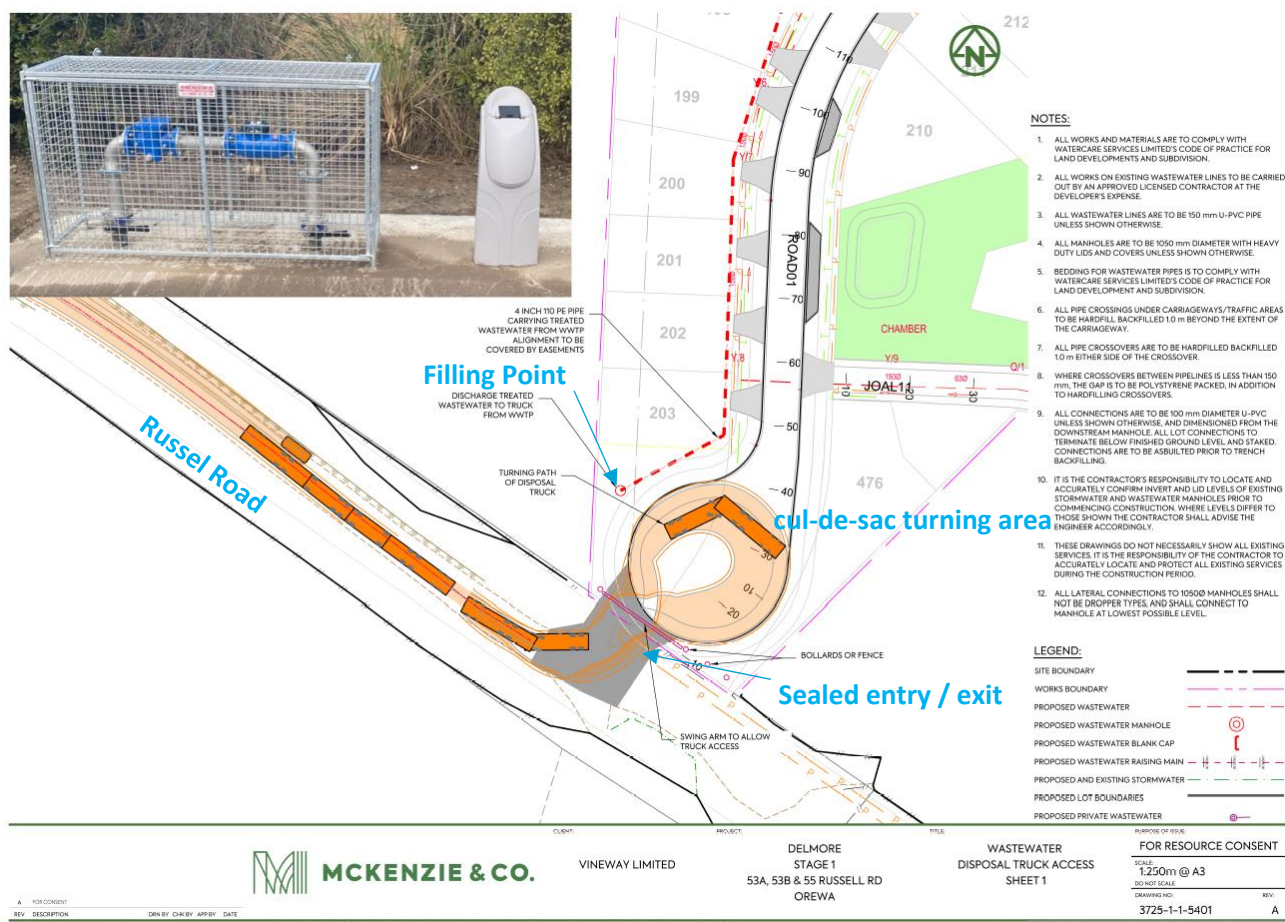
Proposed layout of the filling point location and entrance/exit off Russell Road (Air Matters annotations shown in Blue).
